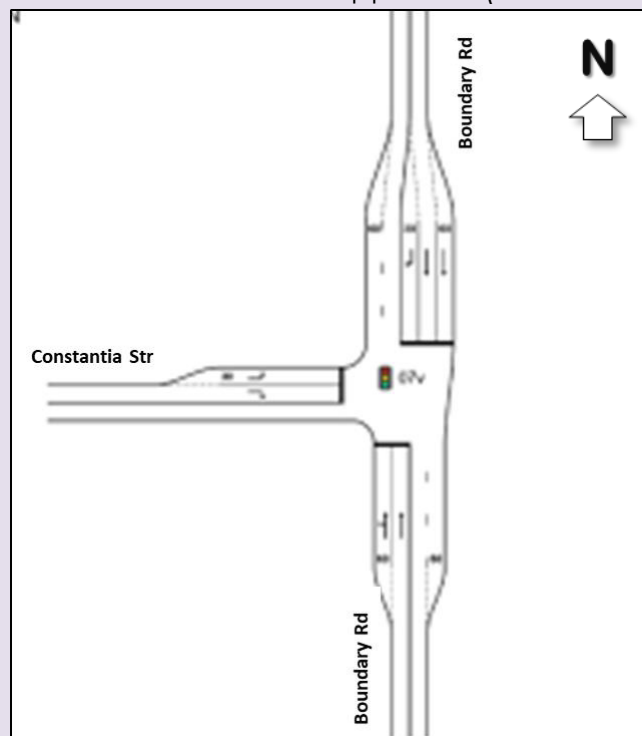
Proposed upgrades at the corner of Boundary Road and Constantia Street
